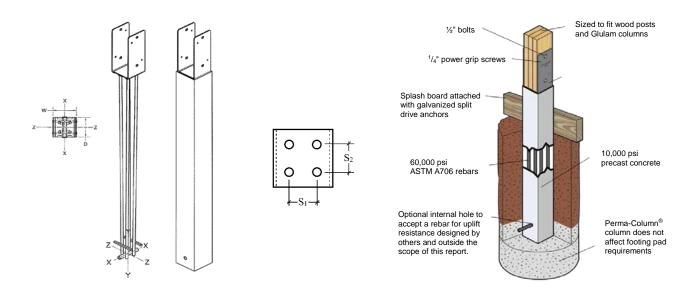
AN ILLUSTRATION OF PERMA-COLUMN[®] COLUMN (LEFT) AND TYPICAL INSTALLATION (RIGHT) WITH INTERNAL SLEEVE
